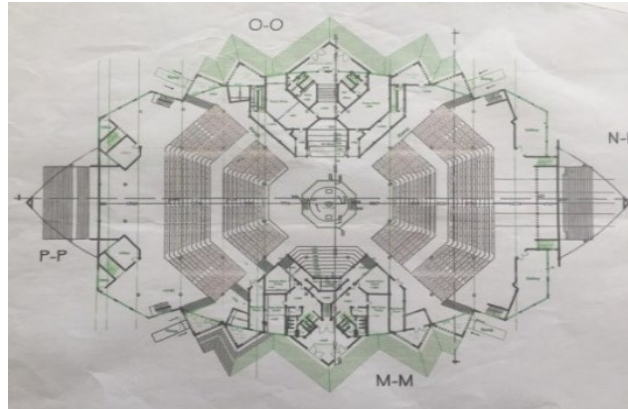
Ground Floor Plan - Government Ecumenical Centre, Igbogone
